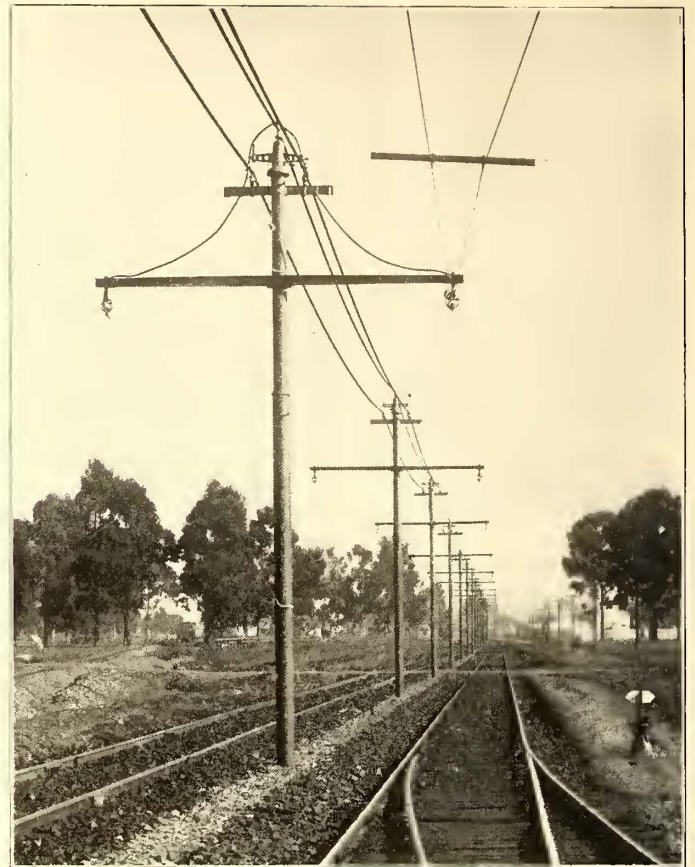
DOUBLE TRACK CENTER-POLE CONSTRUCTION, WITH FEEDER TAP ON FIRST POLE, AND SPRING TROLLEY WIRE HANGER; BALLASTED AND OILED ROADBED
